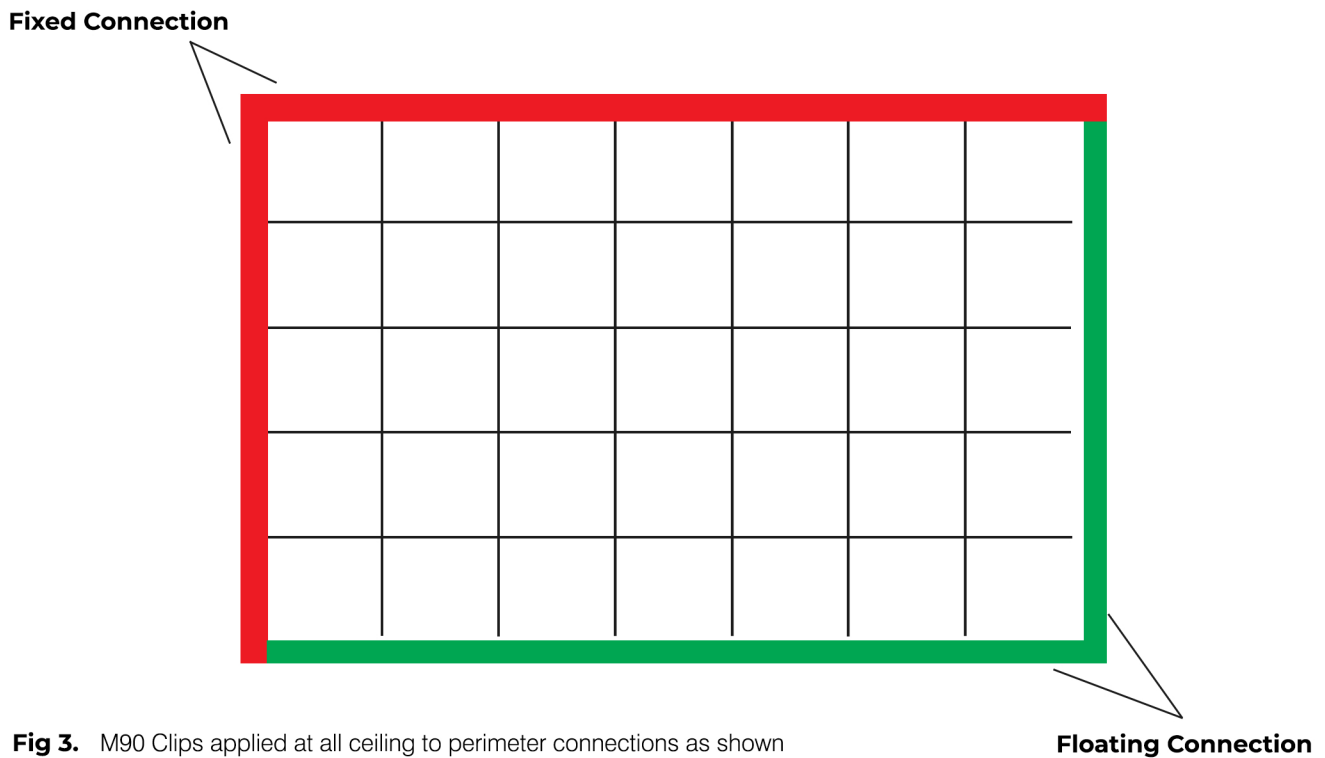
M90 Clips applied at all ceiling to perimeter connections as shown
